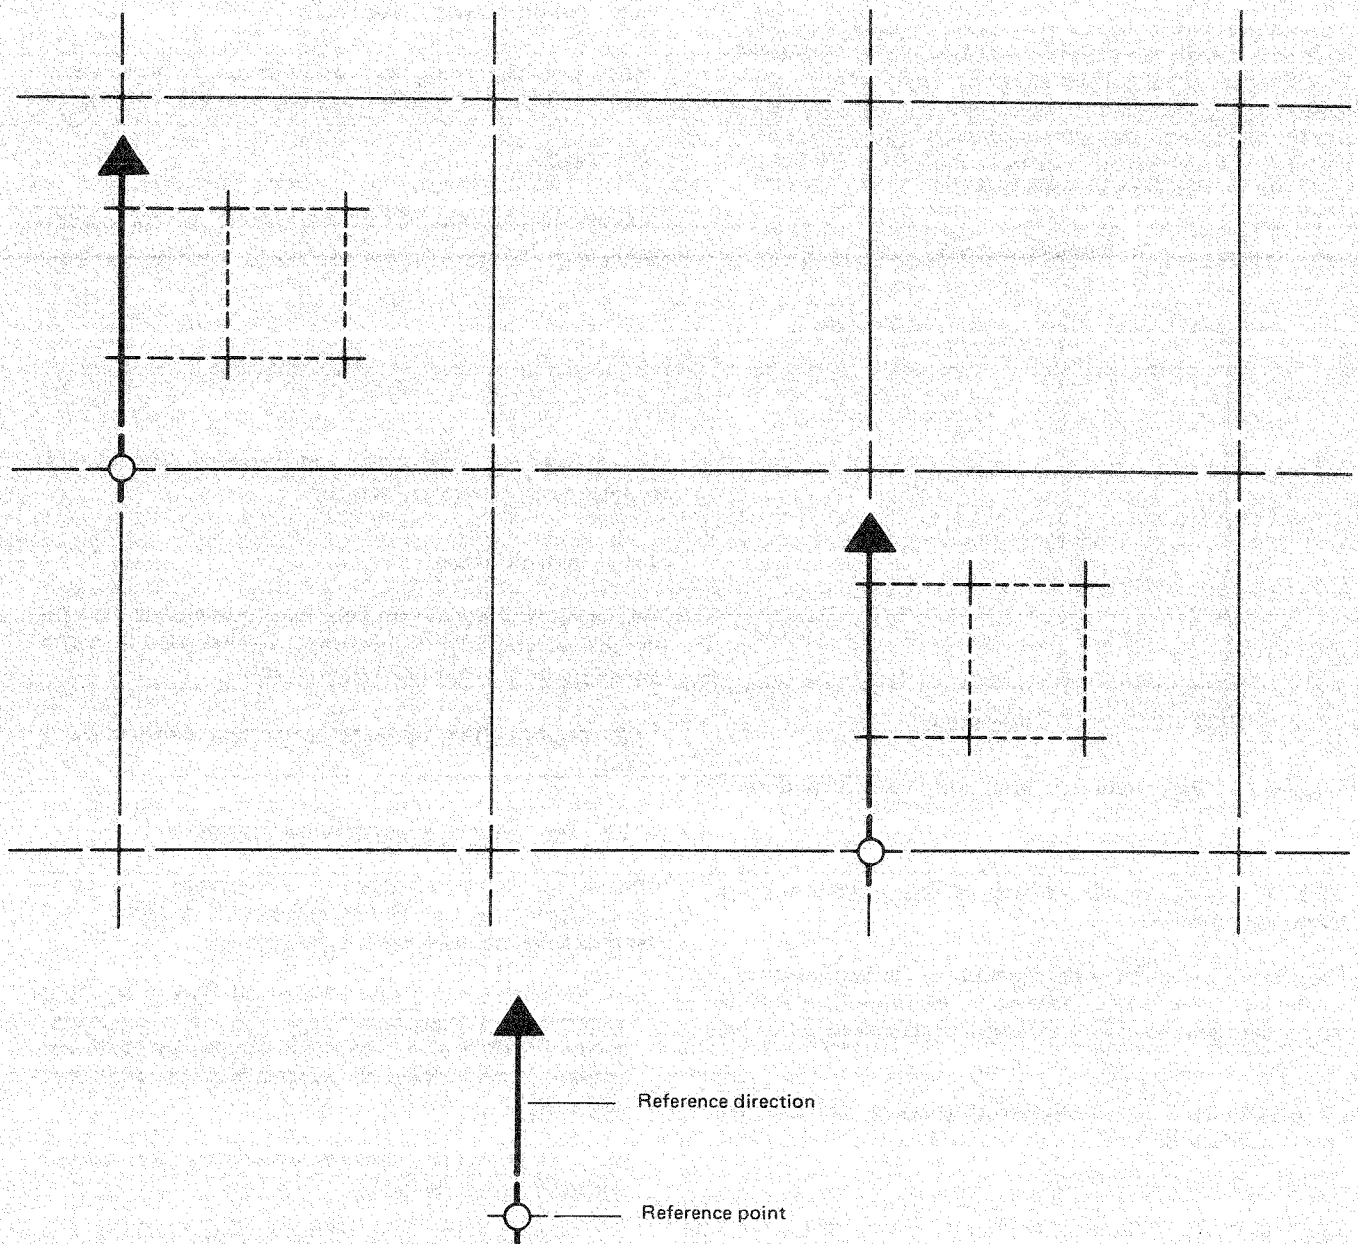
Location grid used as a reference system to indicate the position of structures according to legal building requirements
